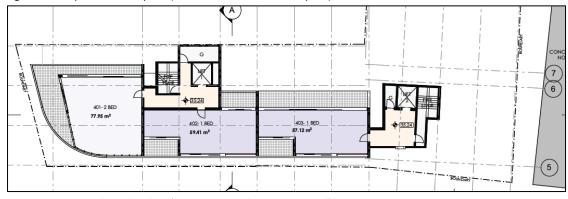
Proposed Level 4 plan. (Source: PTI Architecture Pty Ltd)
